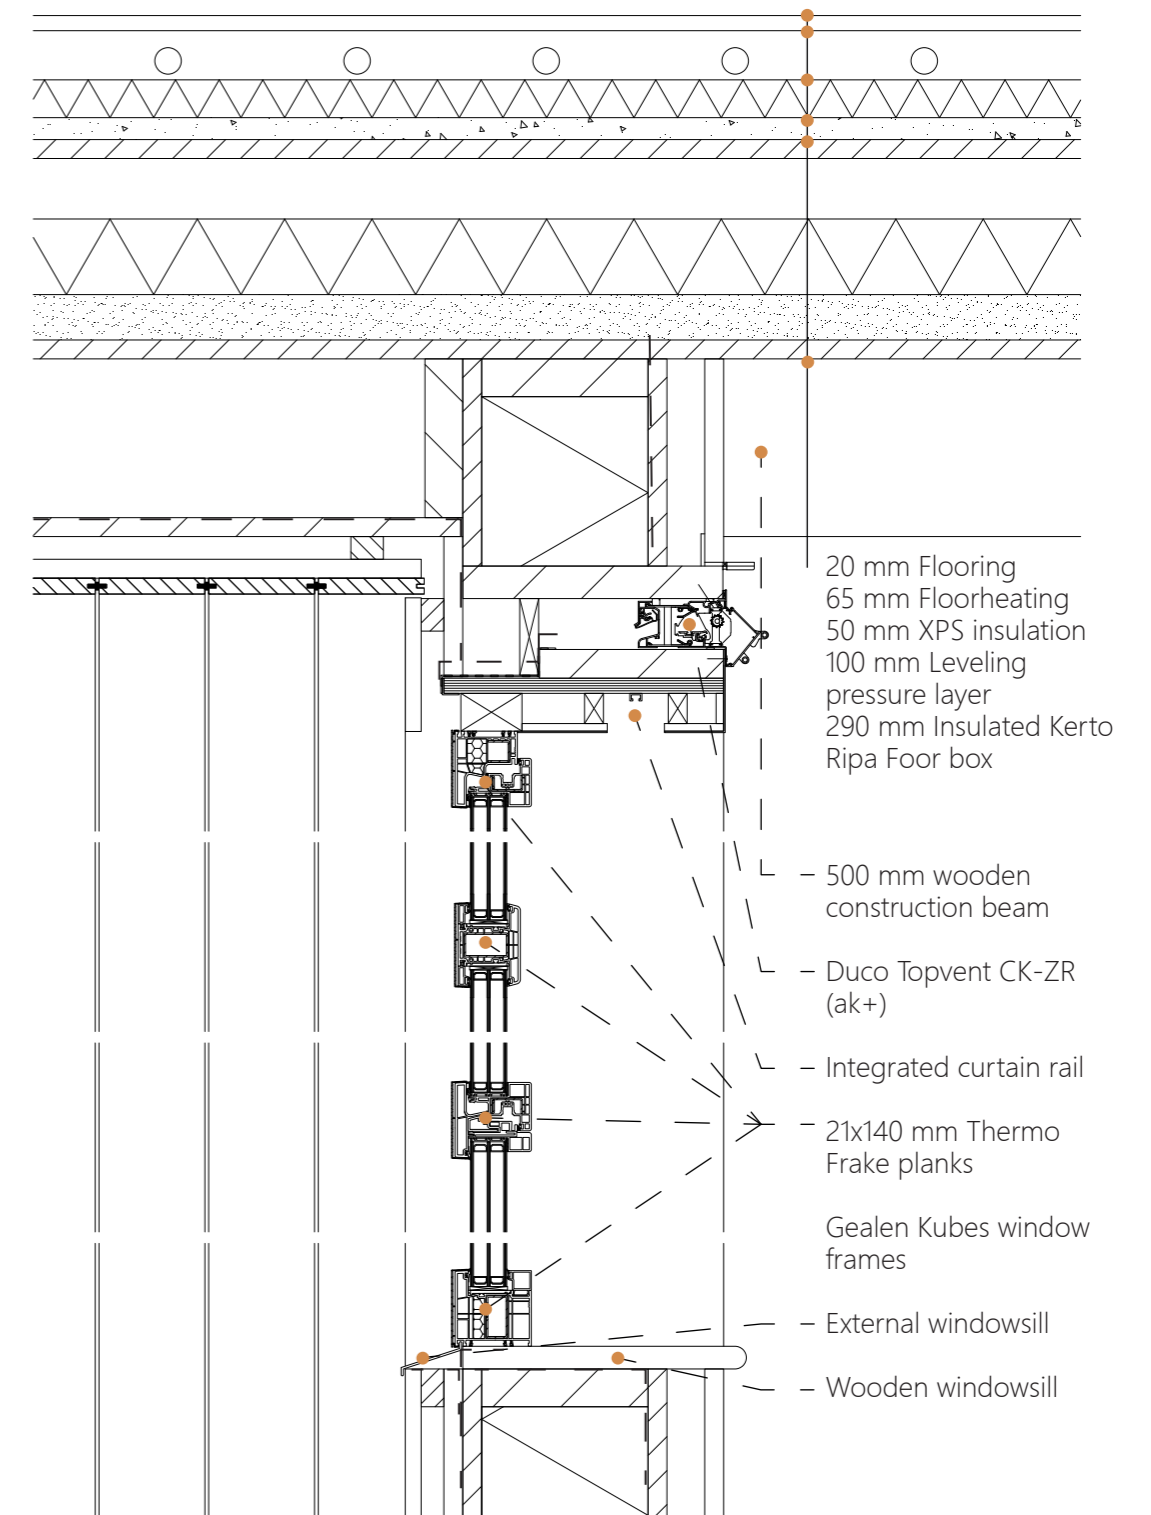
VERTICAL FACADE + BALCONY ROOF 1:5
